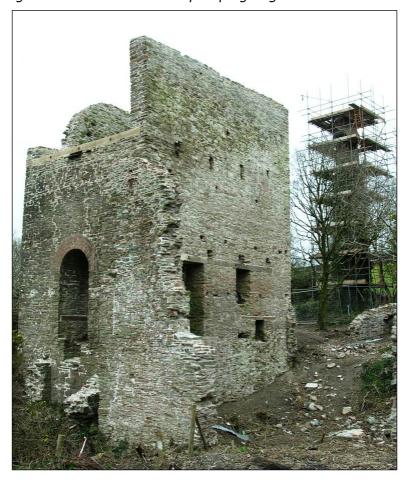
External view of the pumping engine house after works © CC HE Projects 2008
